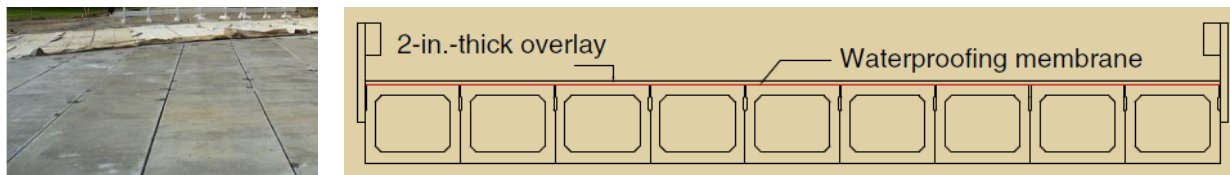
Longitudinal Joints with Shear Keys Formed Between Adjacent Box-Beams
